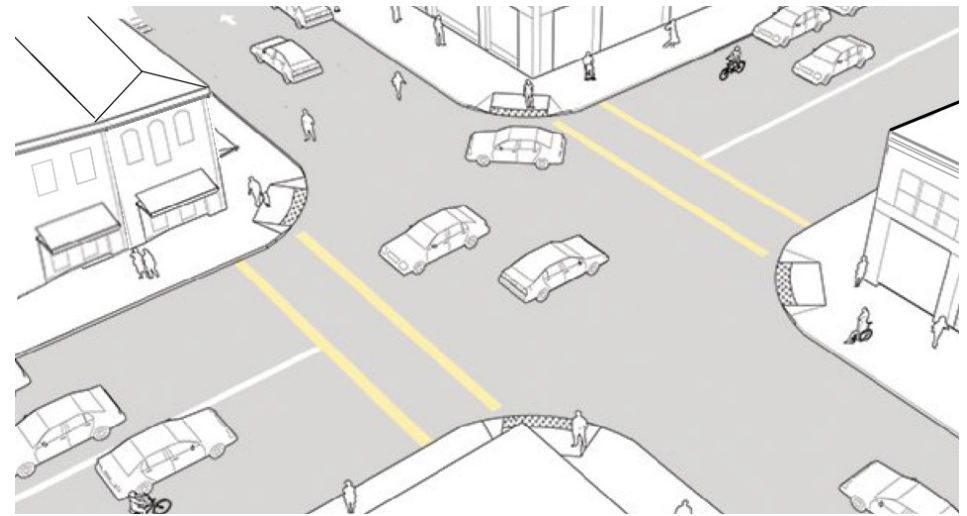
Existing Conditions (Image adapted from NACTO Urban Street Design Guide)
